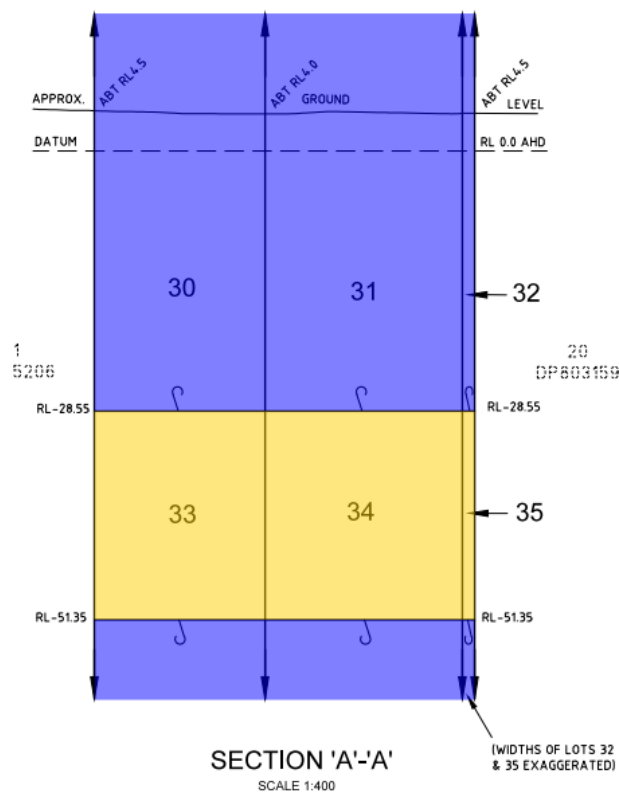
Section view of stratum acquisition for the Metro tunnel
